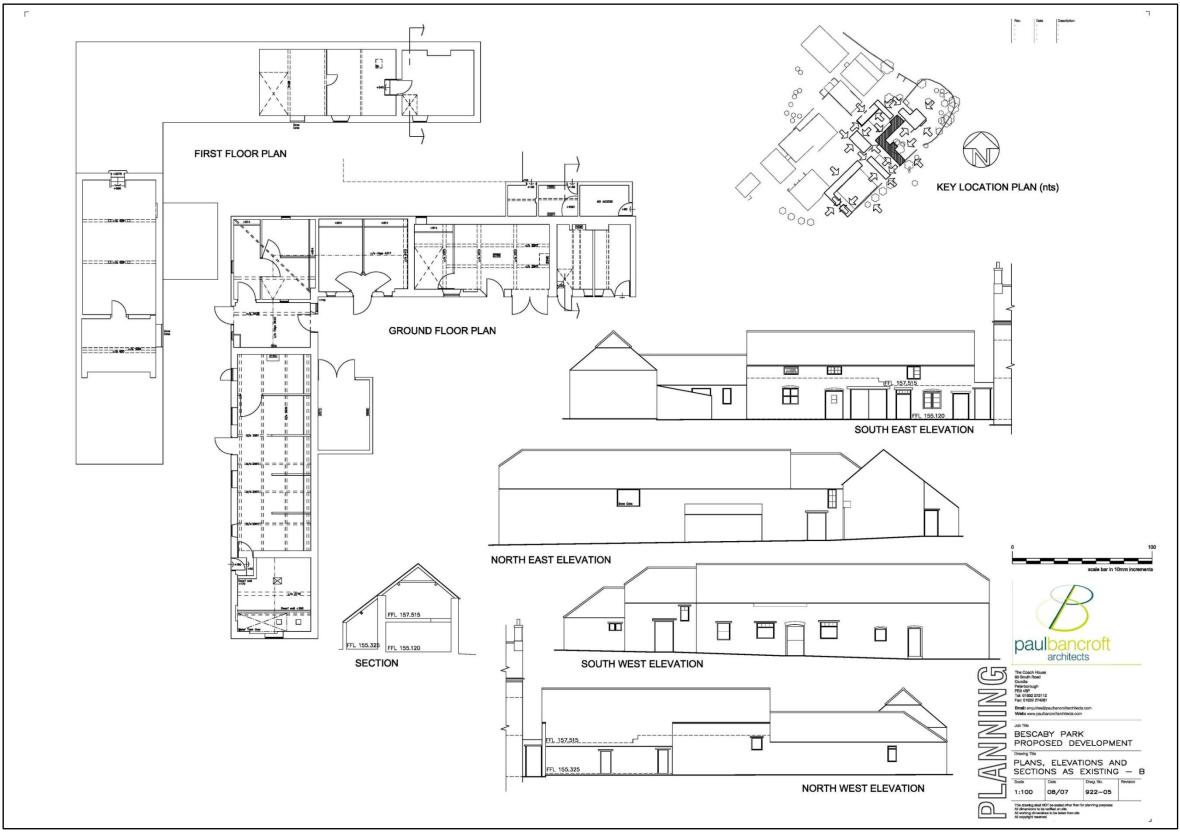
Stable elevations and plans Source: Paul Bancroft Architects
